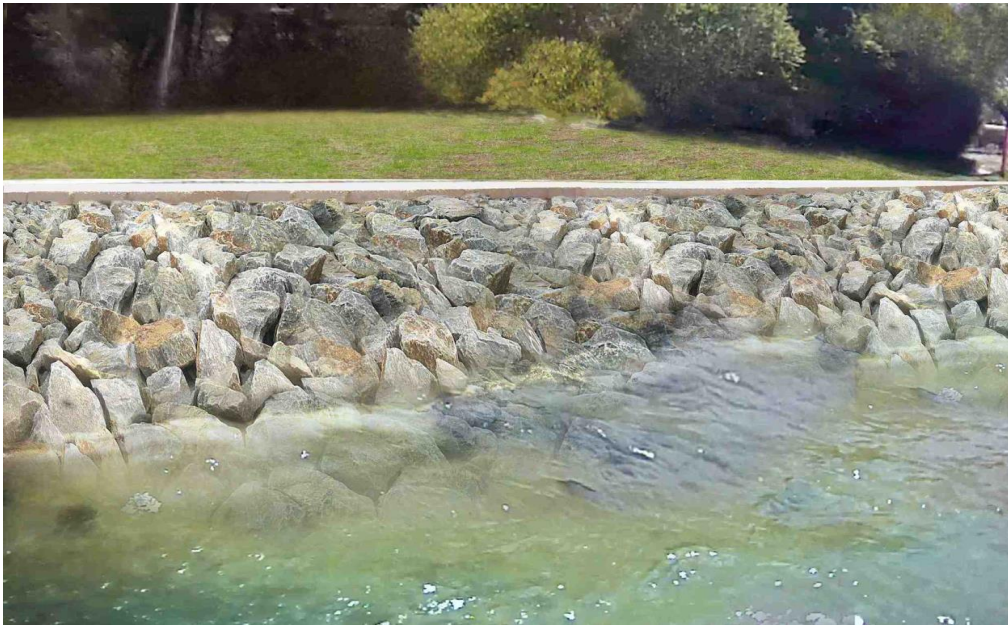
Concept Image - Rock revetment along a Nedlands river wall
